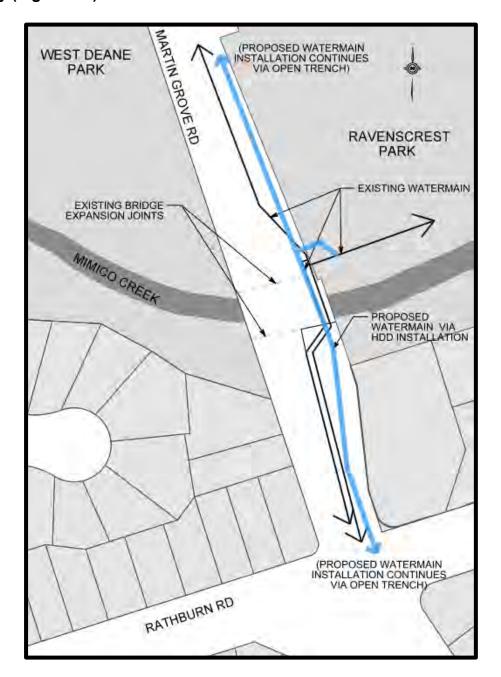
Alternative #2: Watermain aligned below bridge and inside road right-of-way
